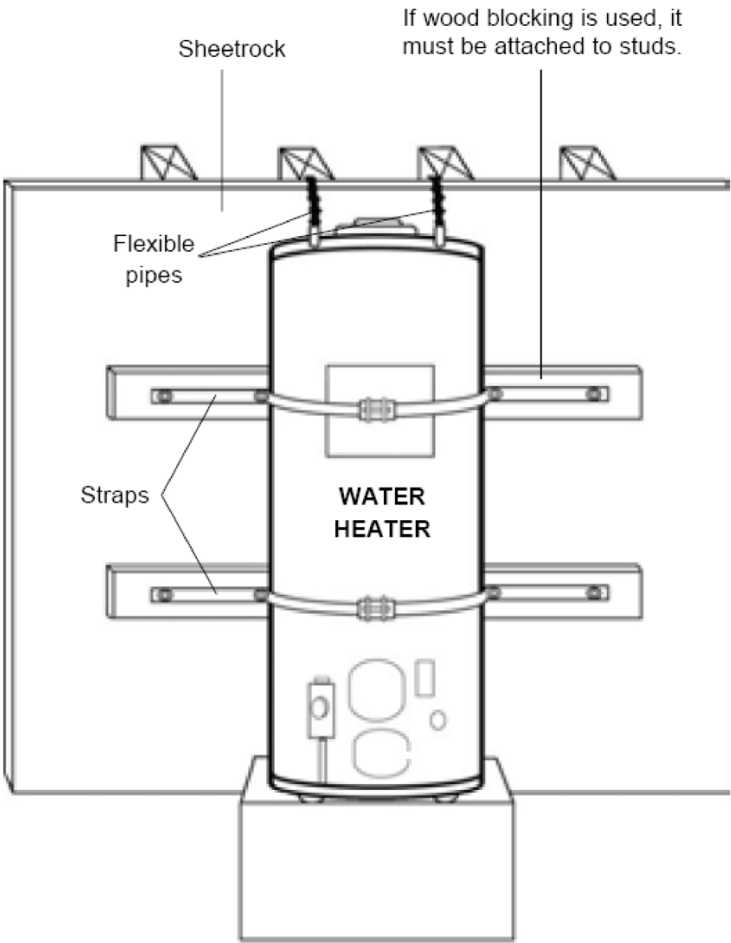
One Method of Water Heater Bracing. Straps and screws visible with water heater in a garage installation. You may need to add wood blocking.
